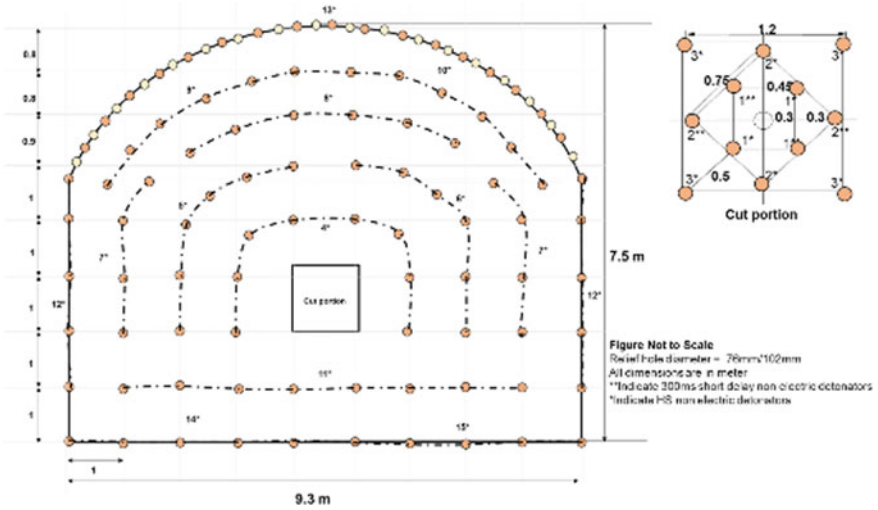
Blast design adopted to excavate D-shaped tunnel
